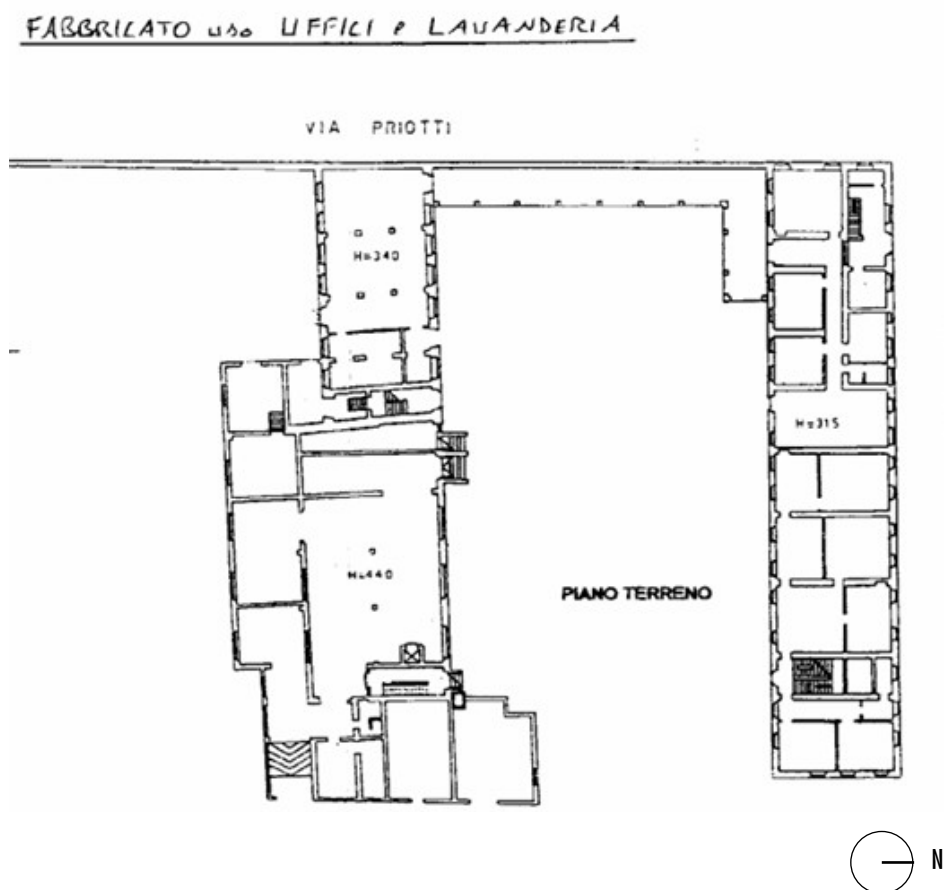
Ground floor plan of Sisters' House I, II, and laundry room.
